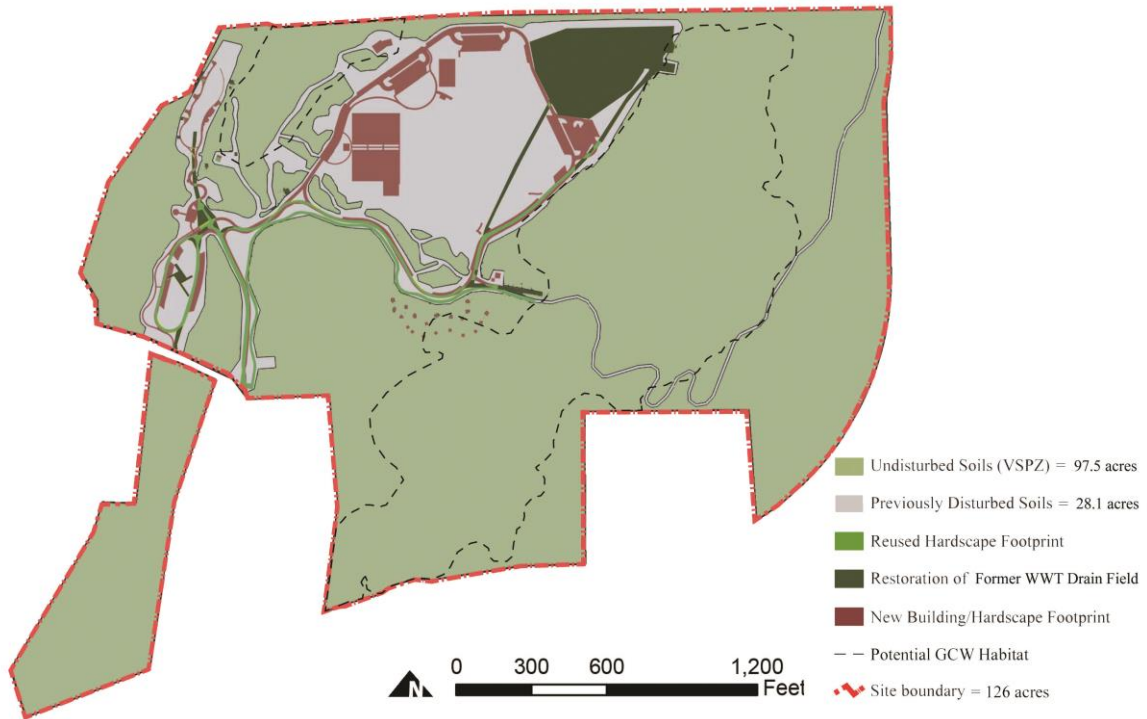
Site plan survey of soil disturbance and building/hardscape footprint (adapted from Design Workshop, PBS&J, and Baker Aiklen Survey)
